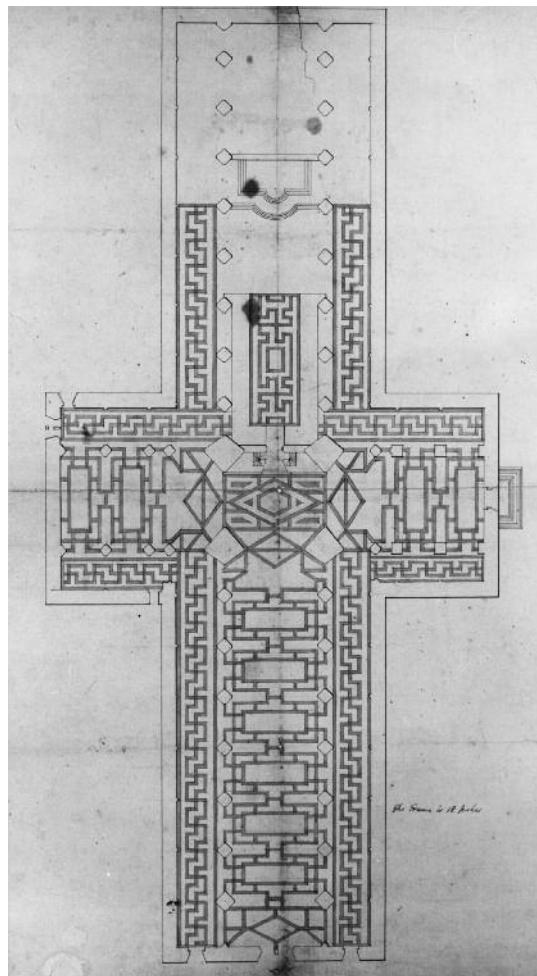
Francis Bickerton, York Minster, plan of the 'New Pavement', pen and ink and wash, 1731, after a design by Lord Burlington and William Kent. *York Minster Archives, B3/2/1.
